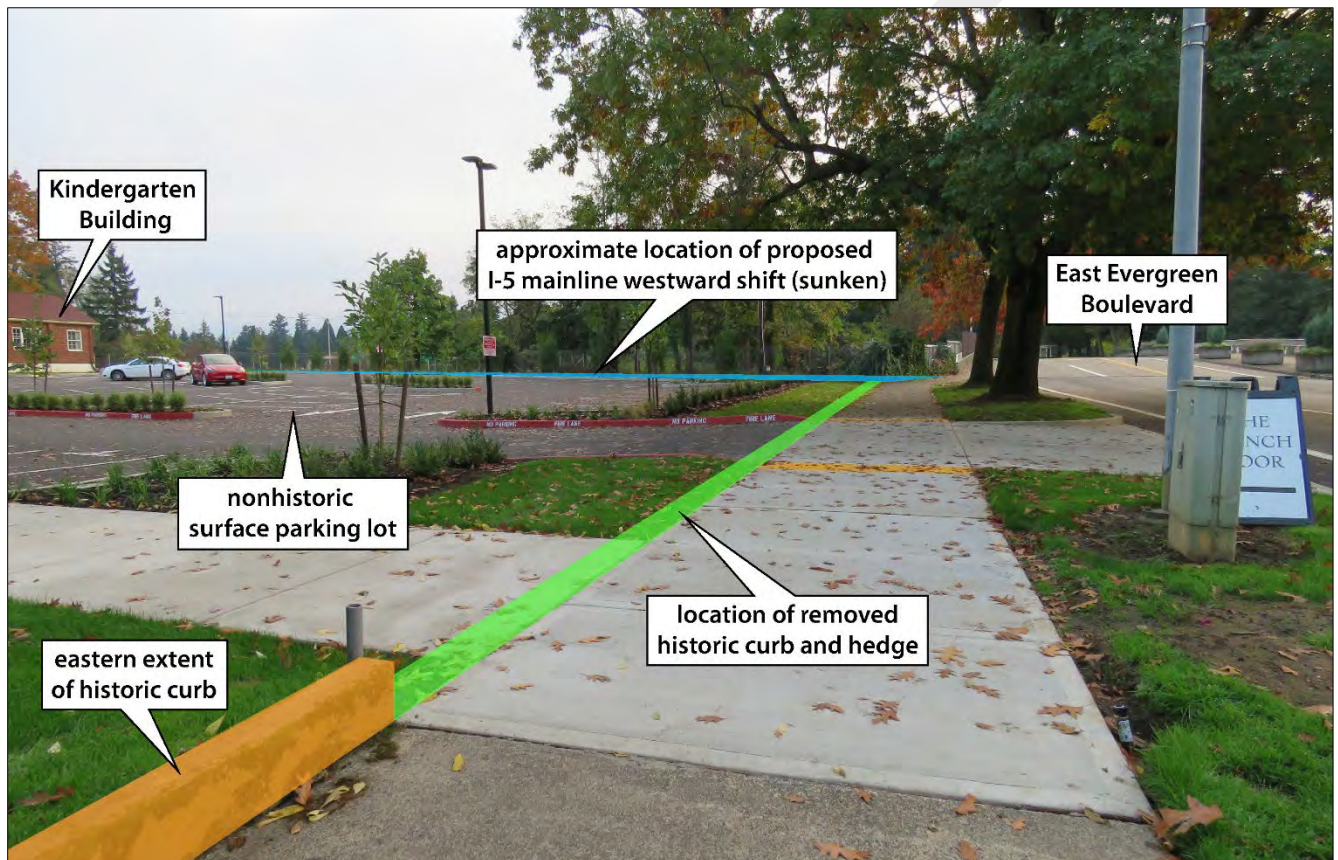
View of the southeast corner of the House of Providence property, facing northeast (ARG, October 2023). This view shows the sidewalk and parking lot along East Evergreen Boulevard, with the Kindergarten Building just visible at the left edge of the frame. The orange shading indicates the eastern extent of the extant historic curb, and the green shading denotes the location of the historic hedge and curb section that have been removed. The blue shading denotes the approximate location of the western edge of the I-5 right of way that is contemplated as a design option of the Modified LPA.
